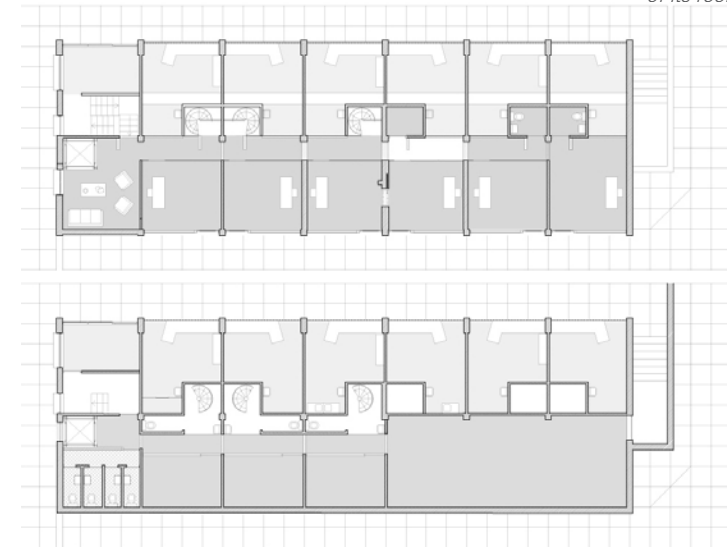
New layout proposal concerning the main pavilion of the Market; ground and first floor plans.
